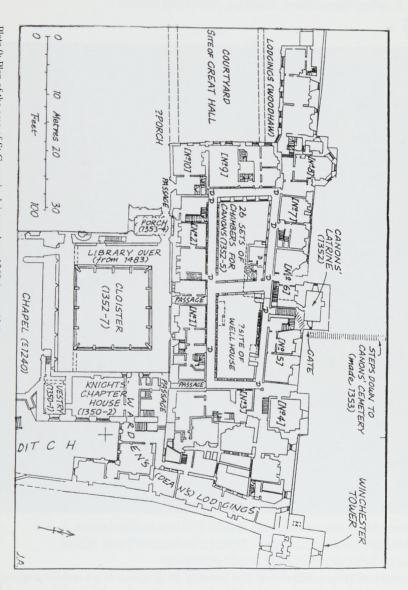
Plan of the area of St George's cloisters about 1360 (see p. 121).
